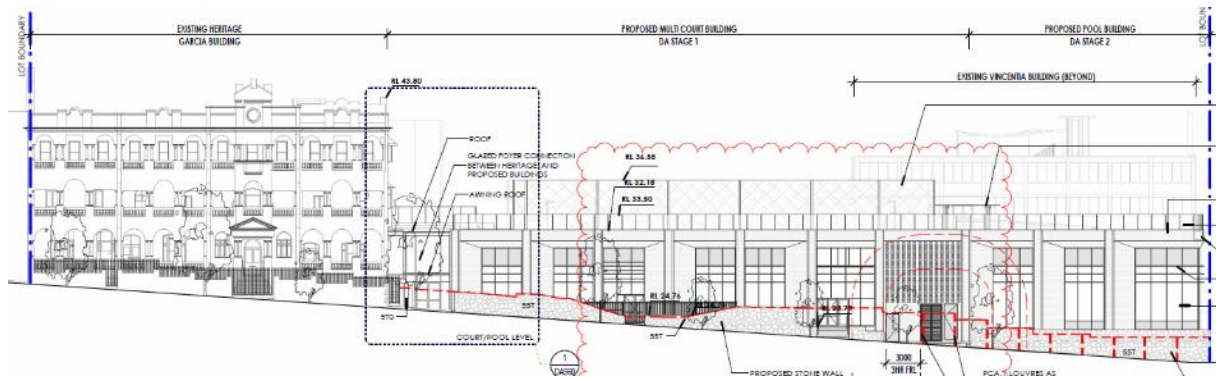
Proposed Elevation - Challis Avenue (Northern Elevation)
